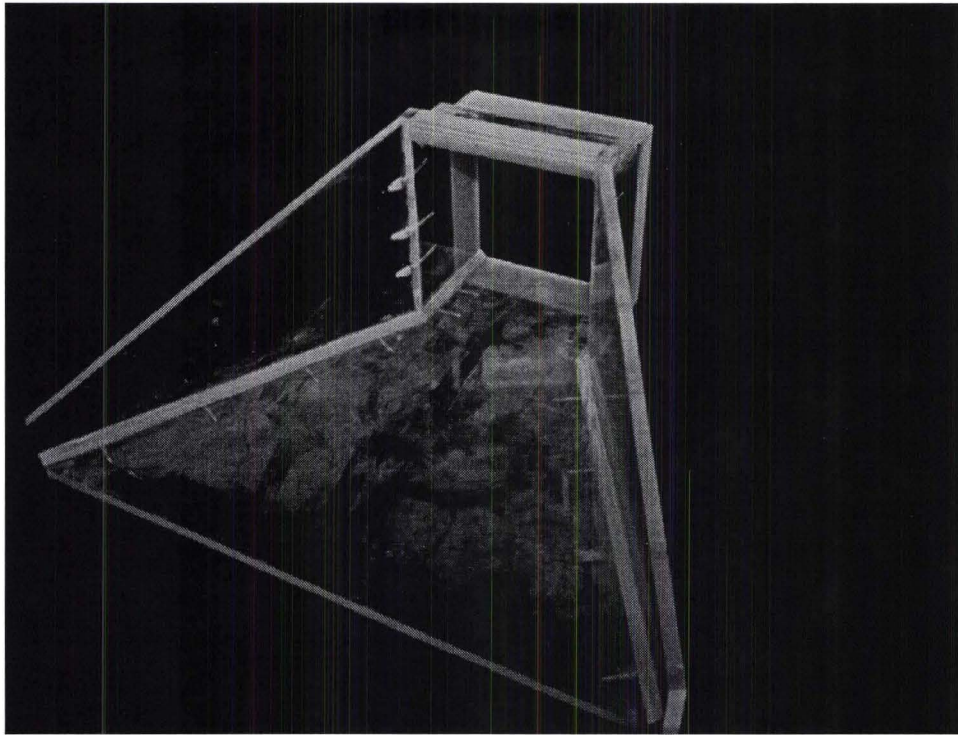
Culvert model 3, cast-in-place, 30-degree wingwall flare.
